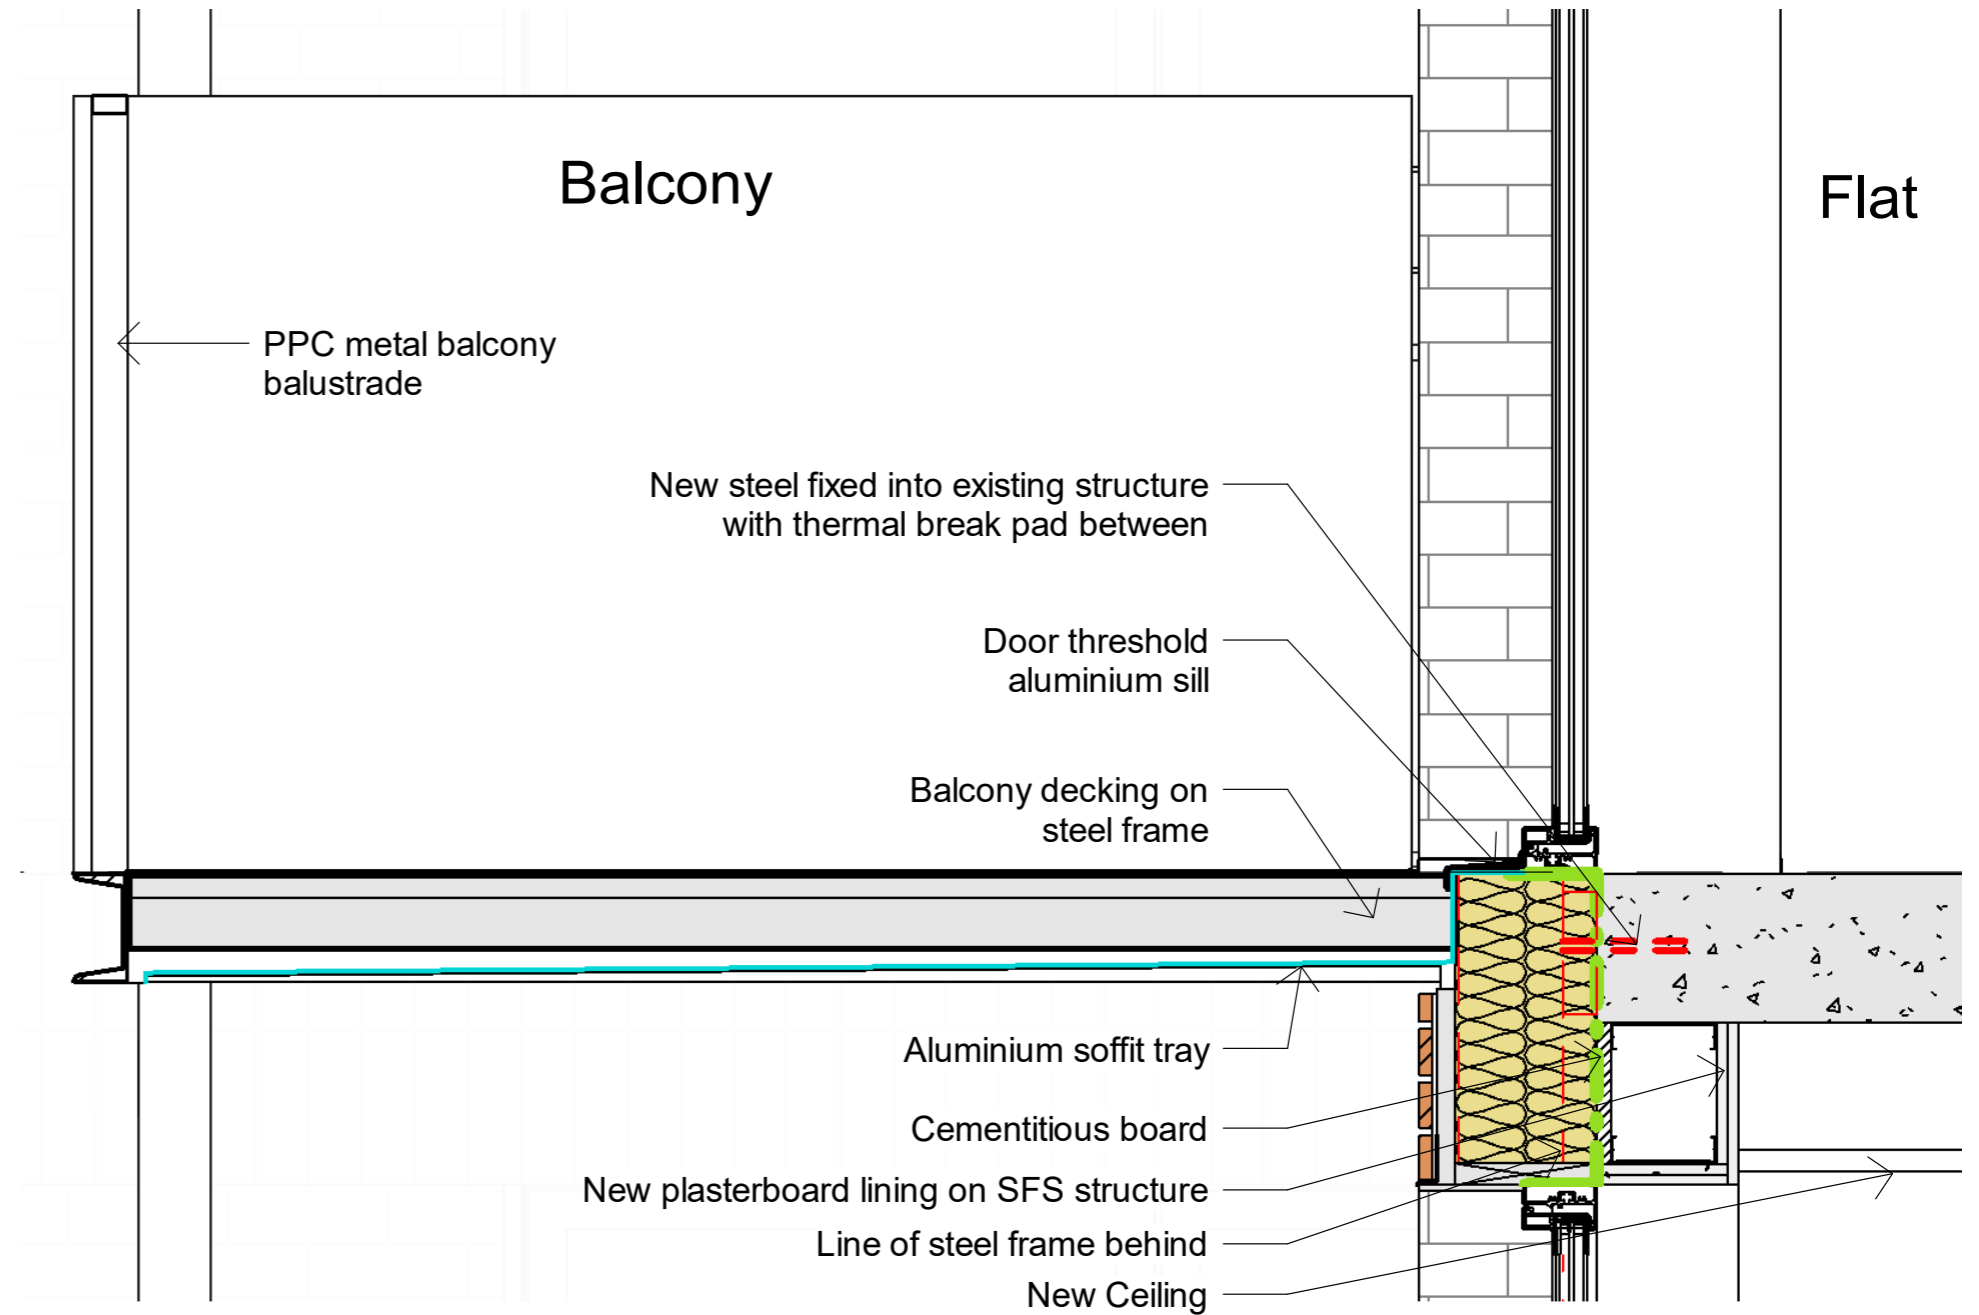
Balcony section - Drip tray below structure is highlighted in blue. Water drips through decking & structure, down onto tray which directs water away from building to front edge of balcony, where it drips off.
